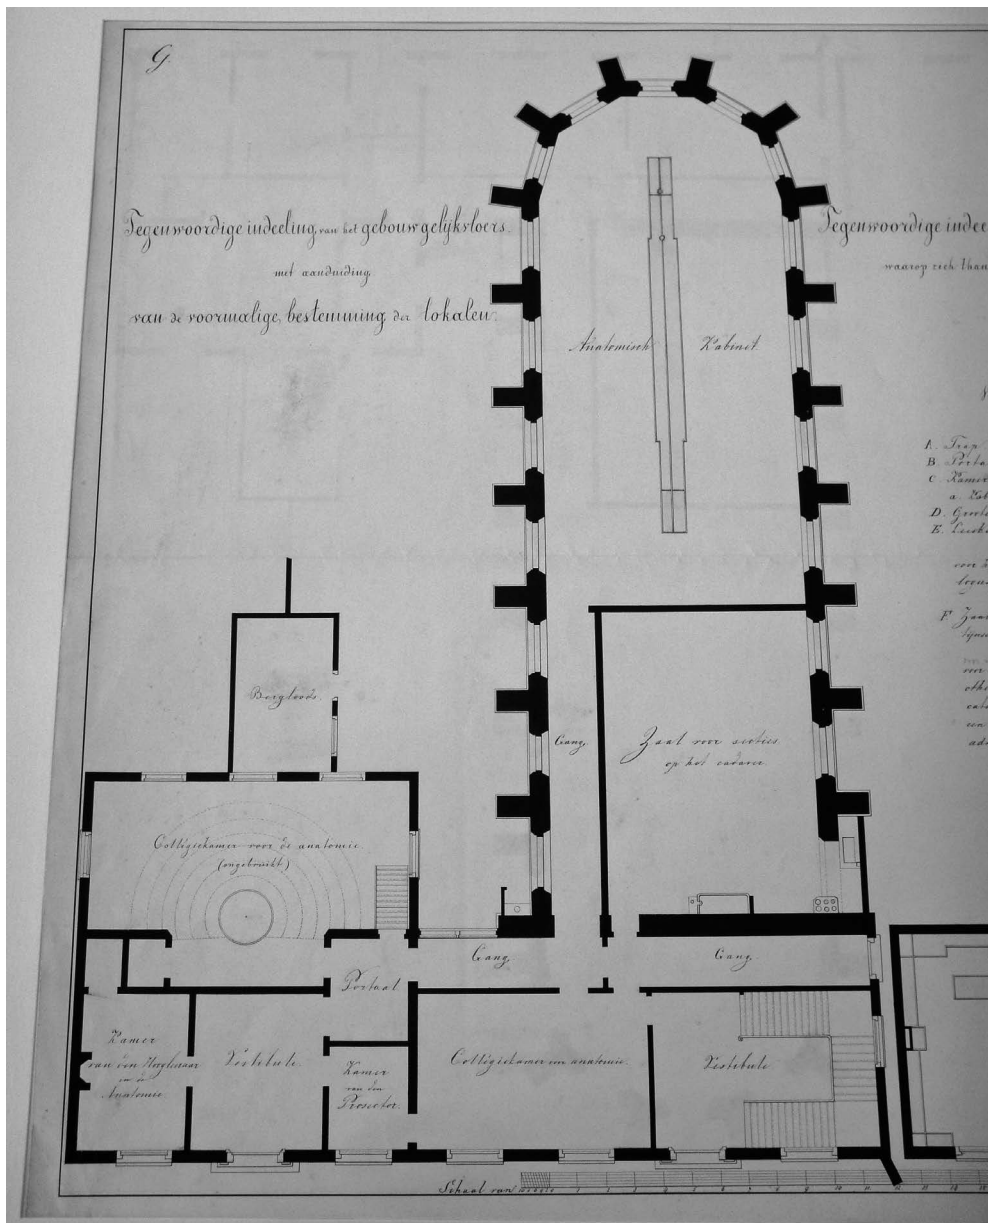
Floor plan of the Anatomical Cabinet after the 1819–1822 renovation. The collection room and the dissection hall are in the old church; the remaining rooms are in the newly built extension.
